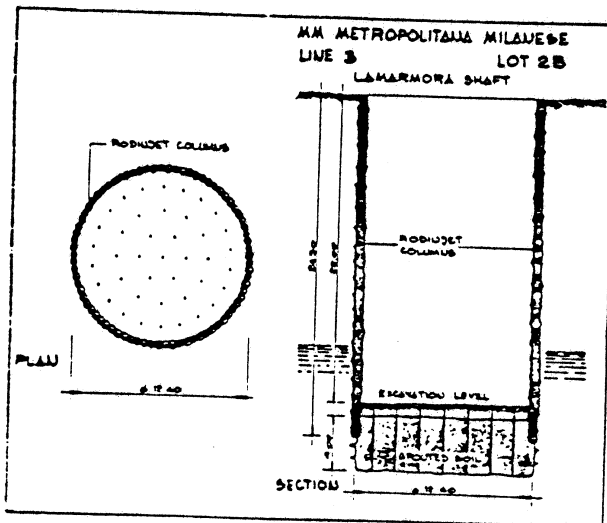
Jet Grouting for Shaft Construction, Milano Metro, Line 3, (Mongilardi and Tornaghi, 1986).
